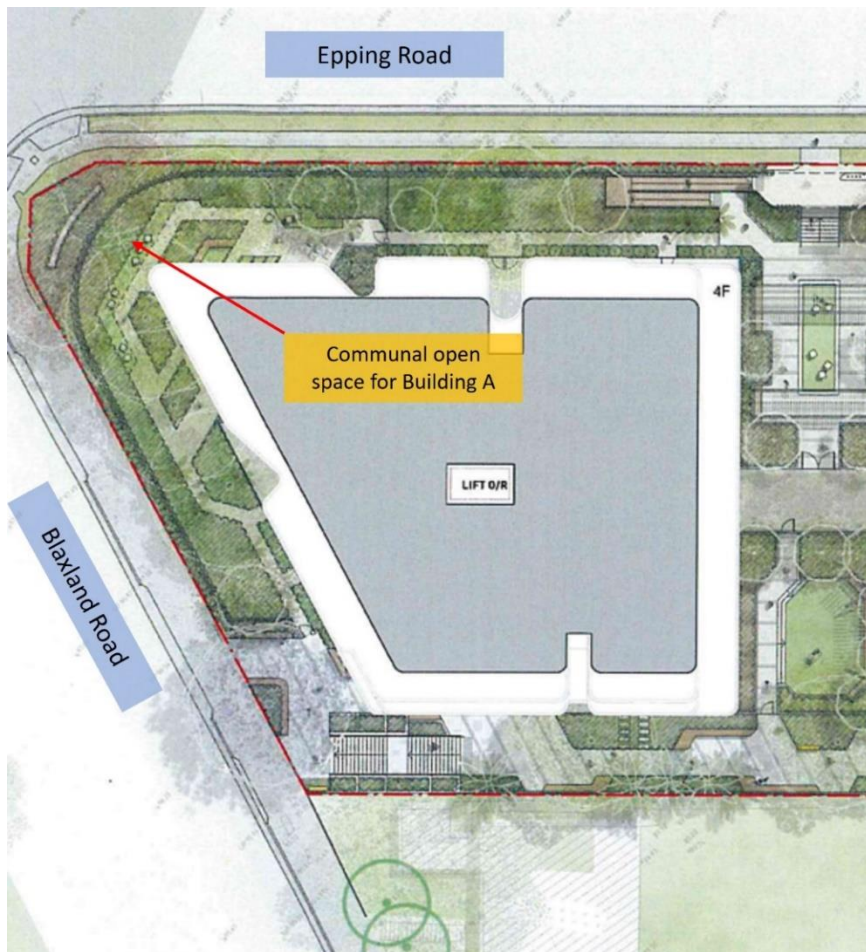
Site plan extract from stamped plans of DA/397/2020 (Source: PTW Architects)
